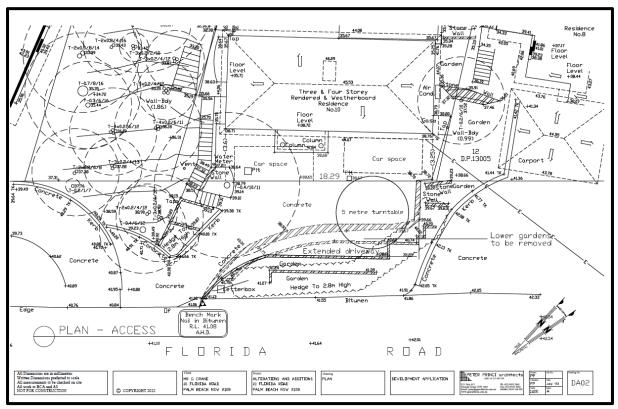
Proposed Plan (Source Plans prepared by Peter Princi Architects)
